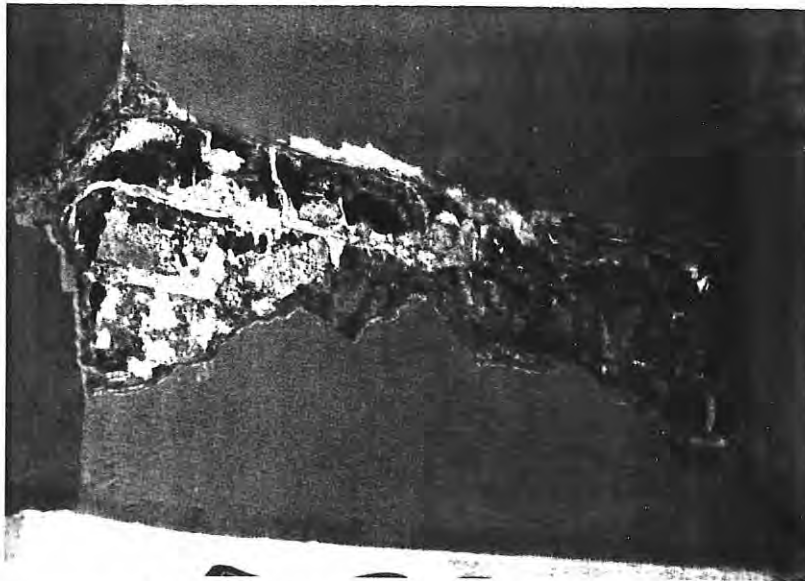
Many of Charleston's stuccoed buildings were originally of exposed brickwork. When finely tooled mortar joints are found beneath existing stucco they should be carefully preserved beneath the repair stucco. Here, the original joints and brick faces have been severely damaged by the mason's chisel.
